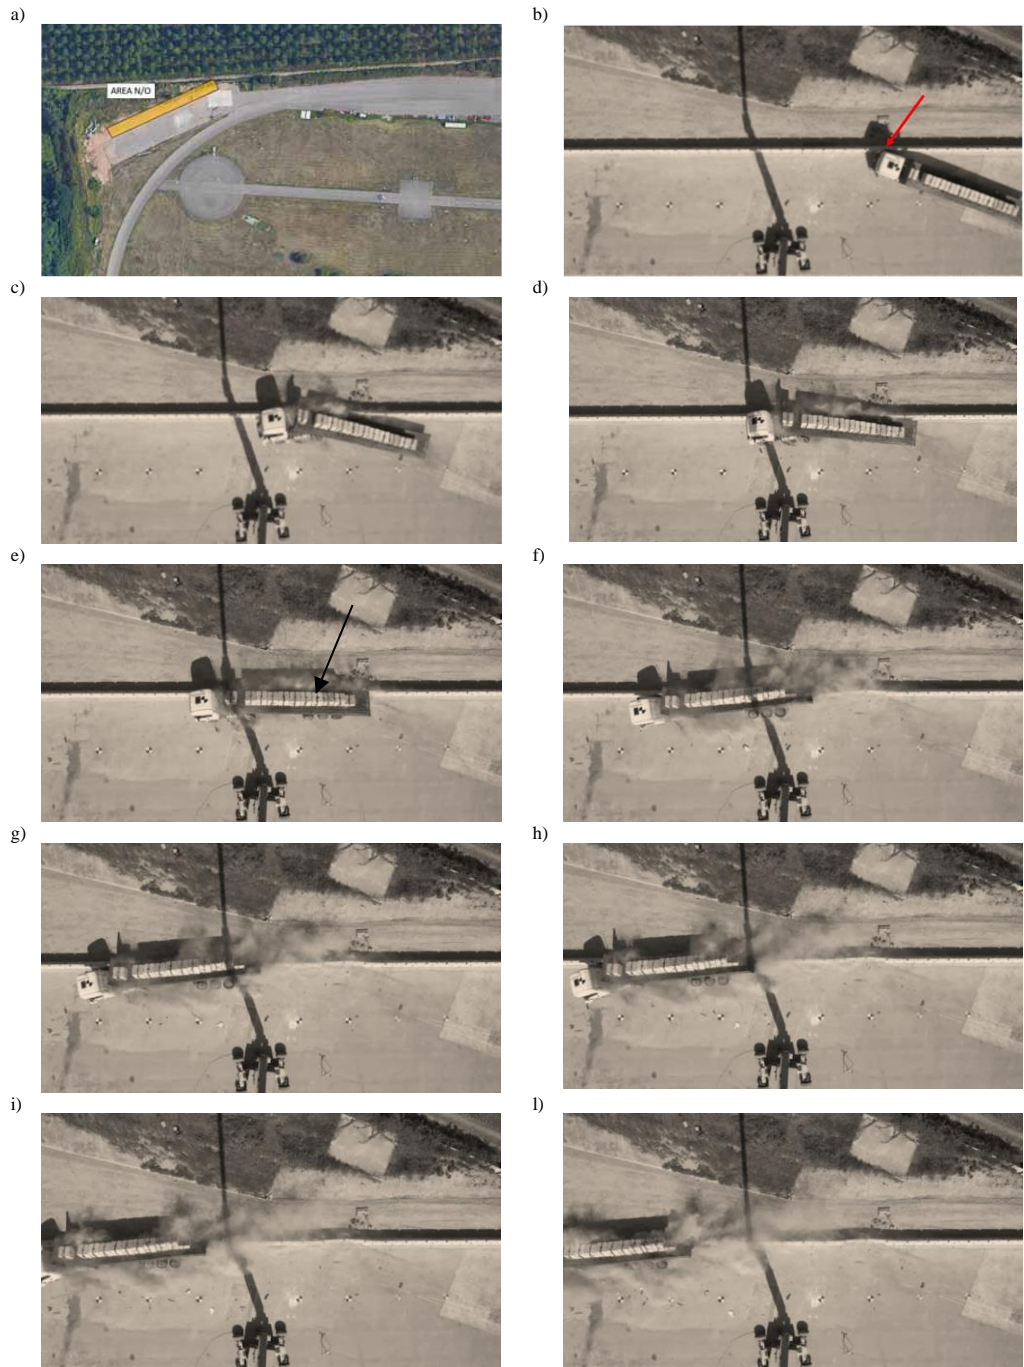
Crash test: a). A view of the testing area; b). to j). Frames from the test sequence
